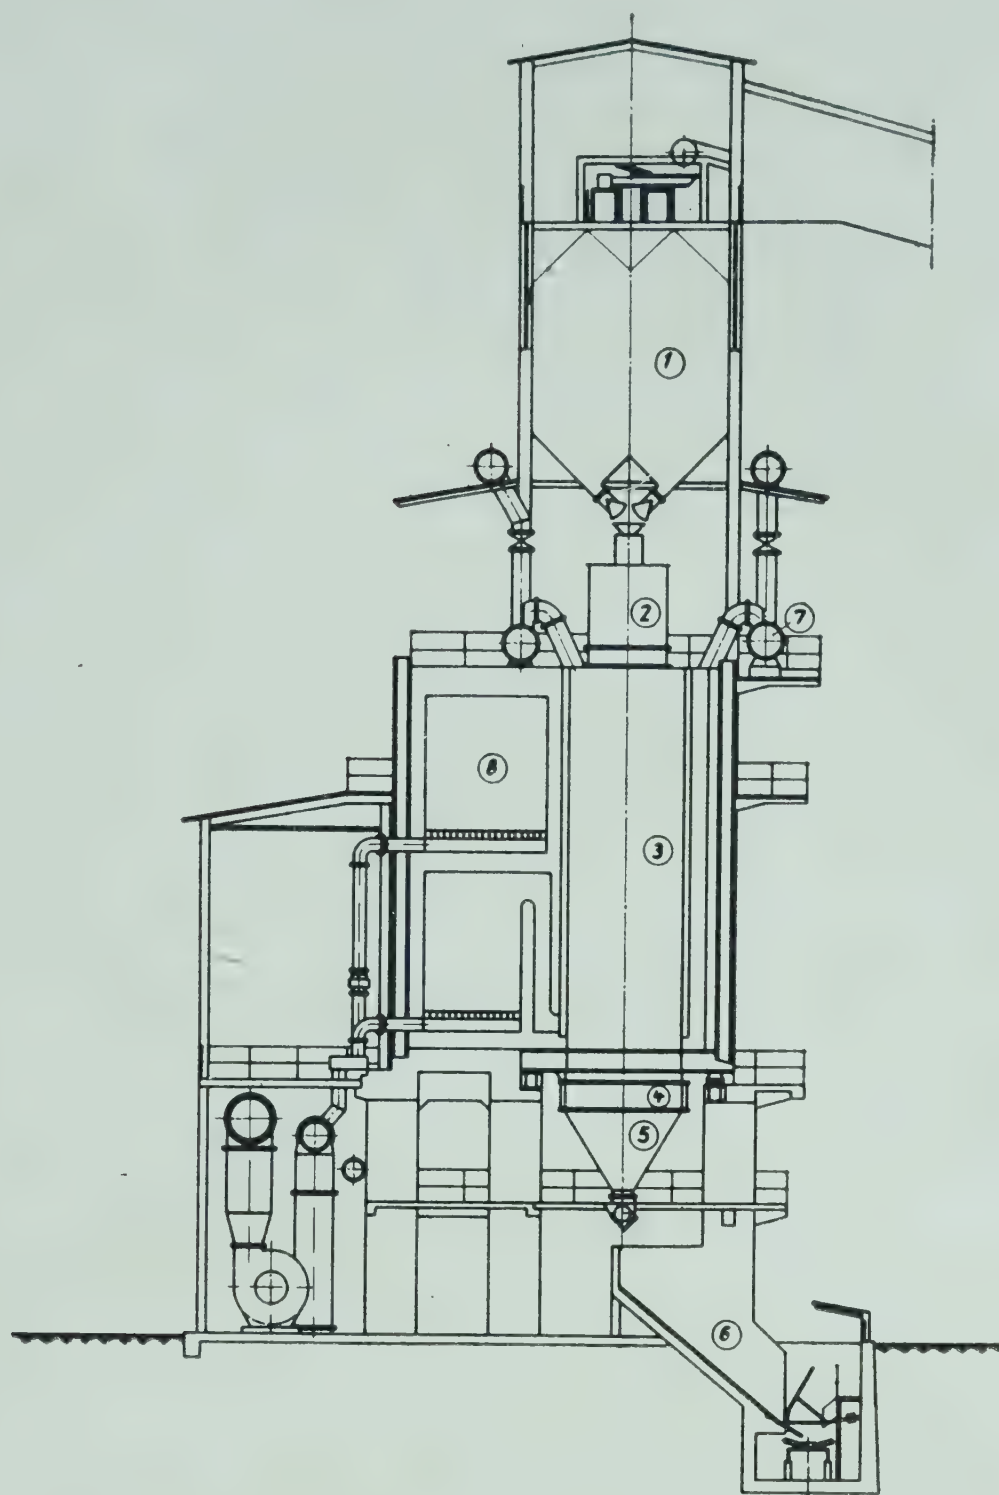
SECTIONAL VIEW OF THE COMBINED HEATING SURFACE/SPUEL GAS PROCESS—KOPPERS SYSTEM: (1) Coal bunker (2) Charging device (3) Oven chamber (4) Extractor (5) Collecting vessel (6) Coke wharf (7) Gas collecting main (8) Regenerators
